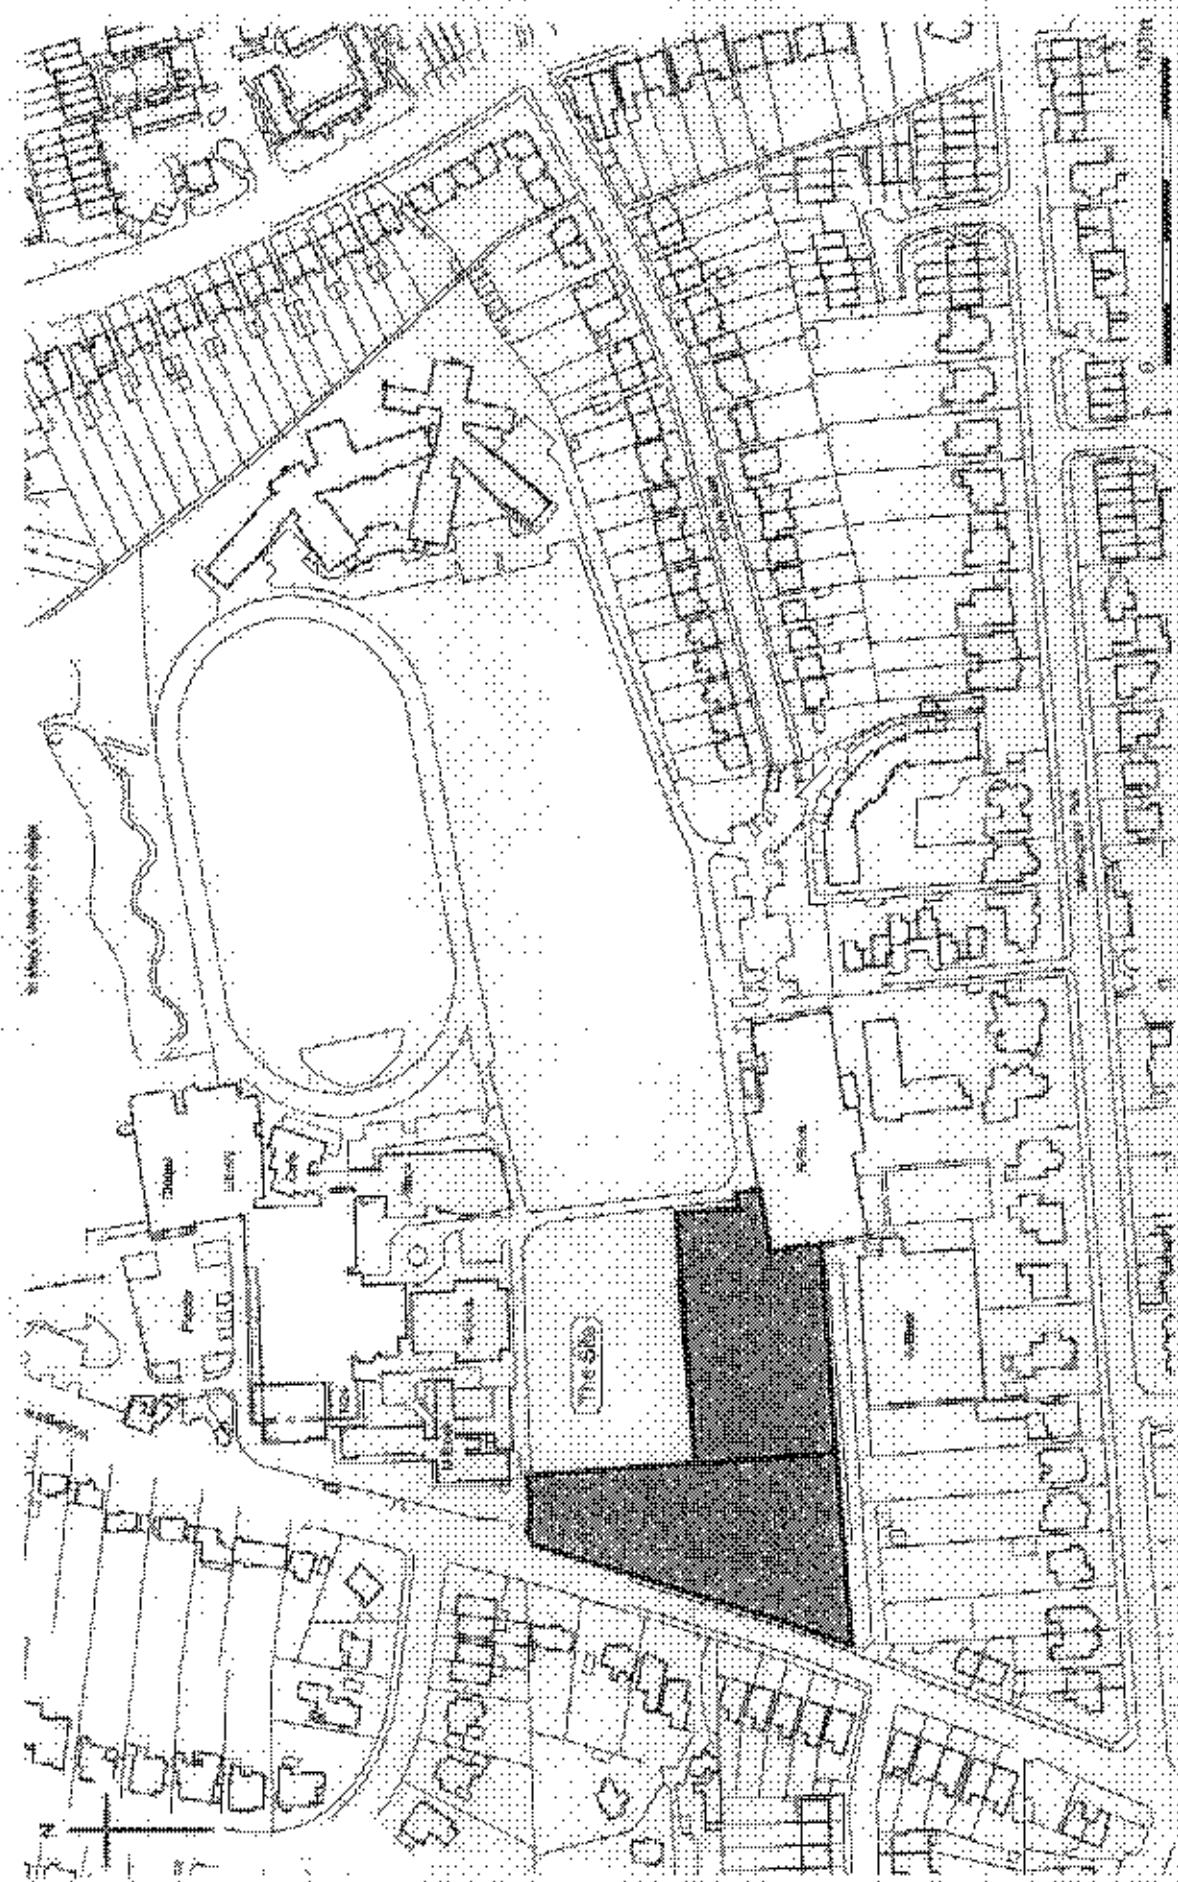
St. Mary's College site plan showing existing Block 2 (shaded from Rivington Street Studio Architects Cw2 no. 0501 November 06)
